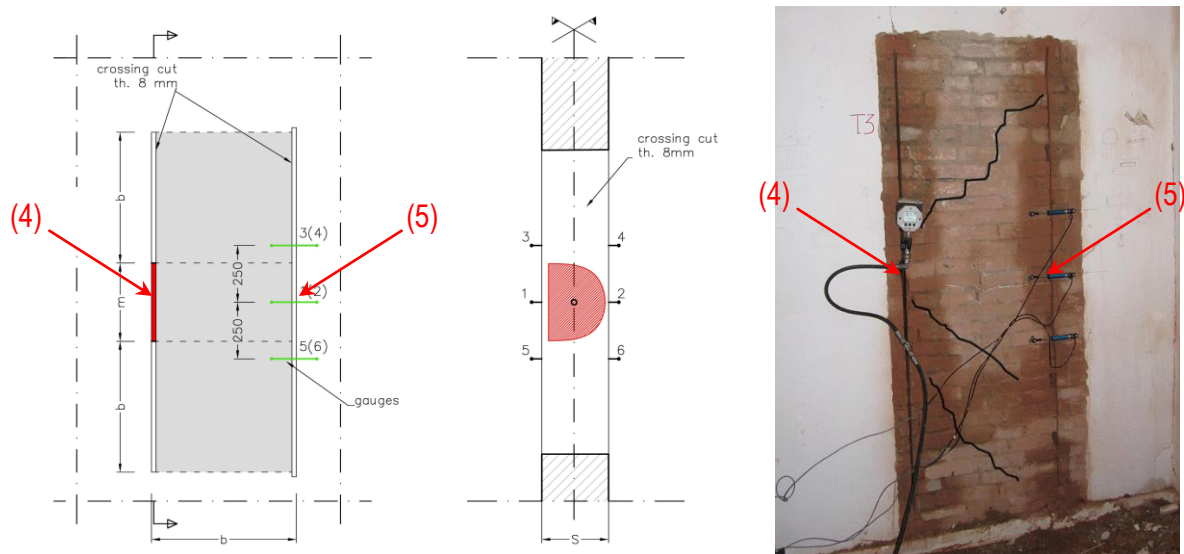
2: Lay-out of shear compression test - Diagonal cracks developed during the test
